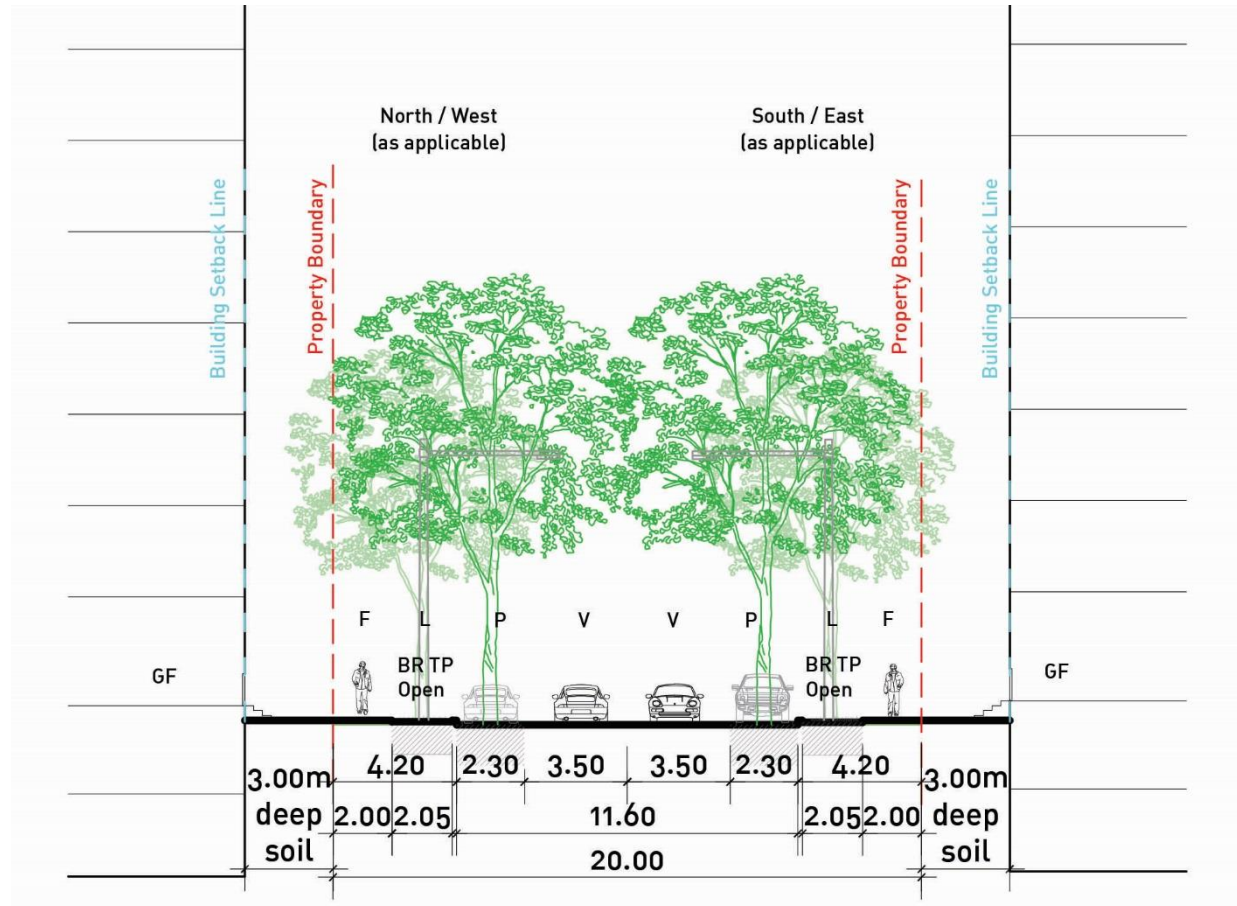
Type 4 Local Street (EWR 3, 5, 6 and NSR 1 and 4)
